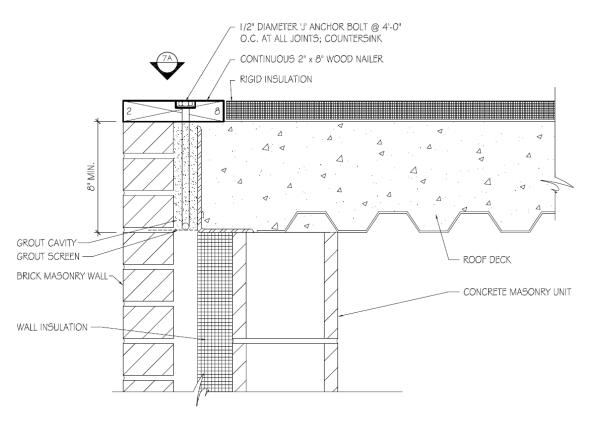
ROOF EDGE WOOD BLOCKING - ANCHOR BOLT SECUREMENT
